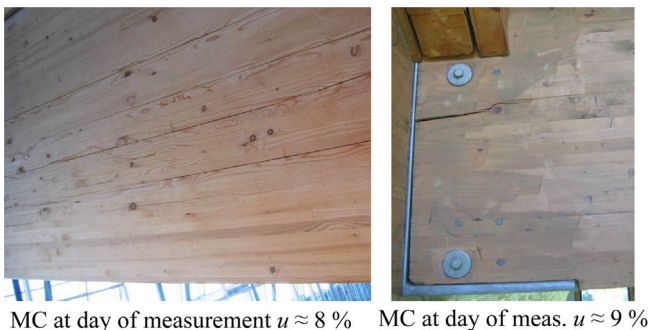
Examples of crack formation in glued-laminated timber (glulam) beams in practice. Free shrinkage and rather evenly distributed shrinkage cracks of small depth (left) and deep shrinkage crack between two rows of fasteners (right).
